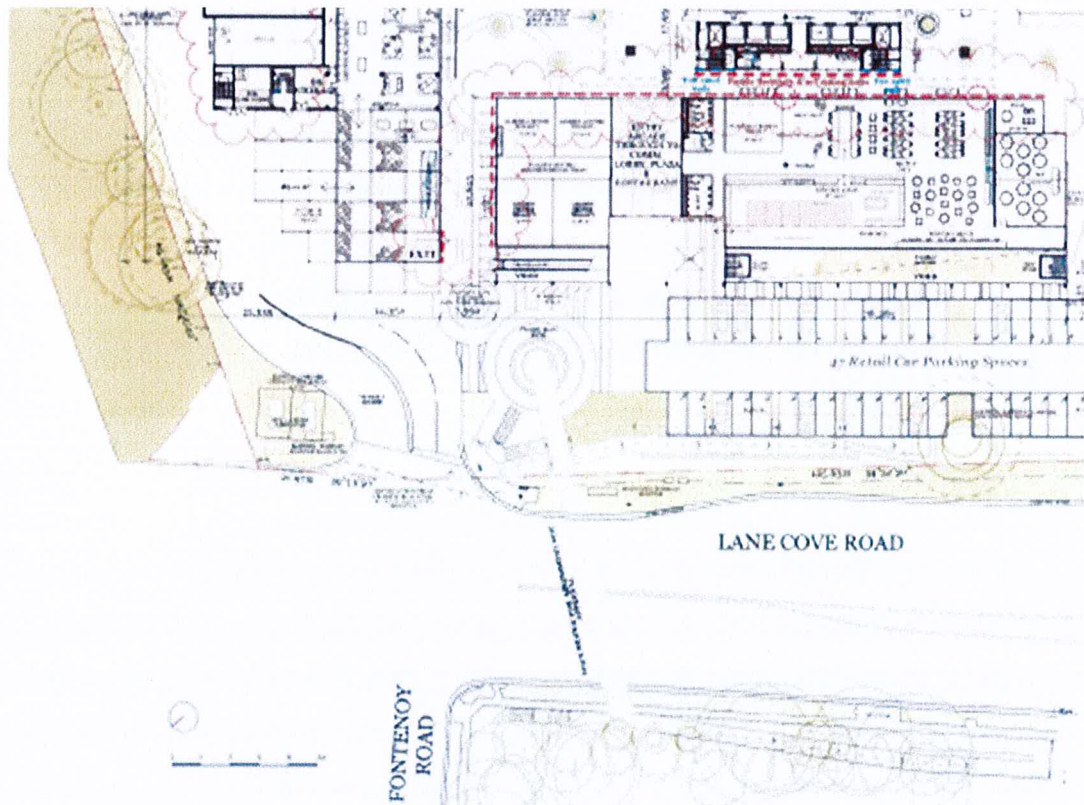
Extract of Ground Floor Plan DA 105 Rev B dated 12/11/2023 (Ex A)
